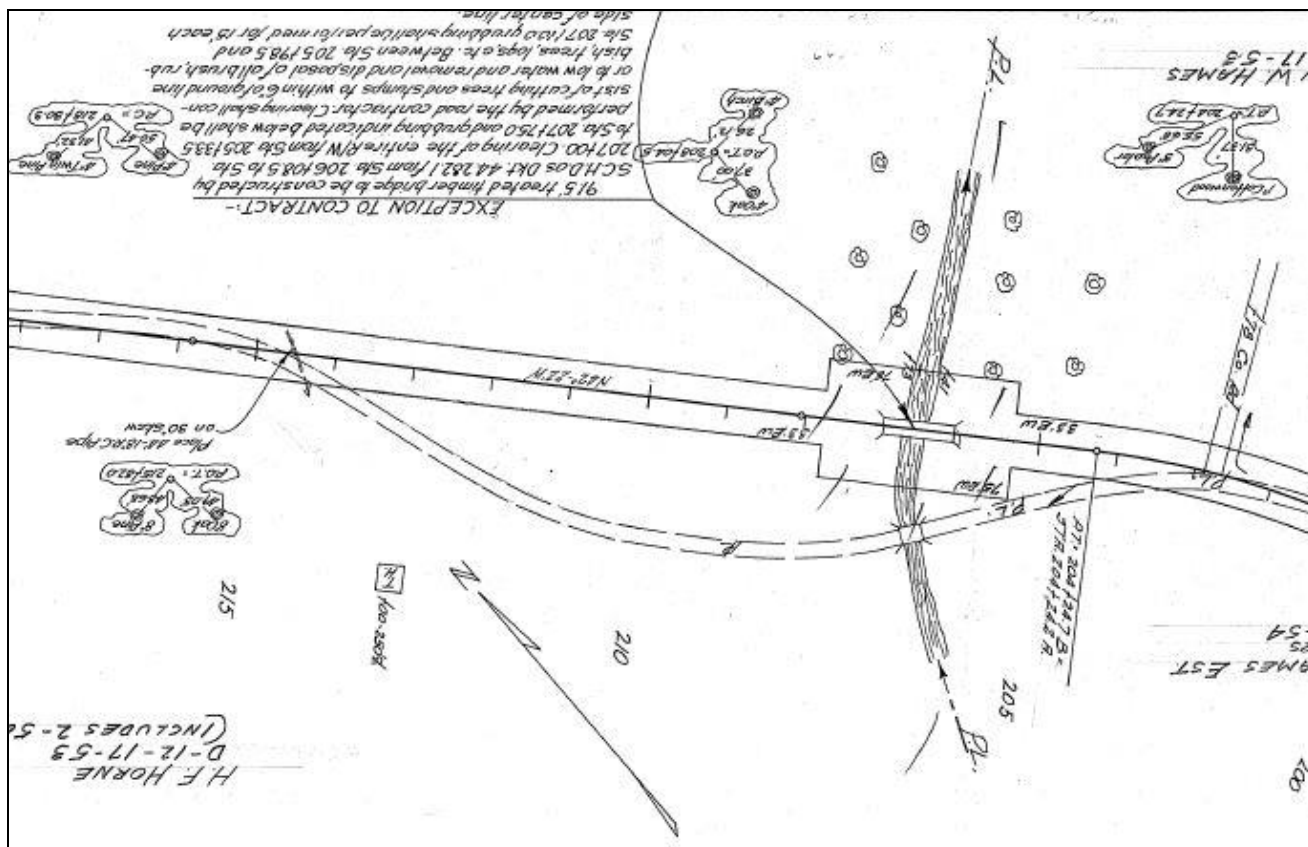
Portion of the 1953 construction plans showing the old road alignment.
